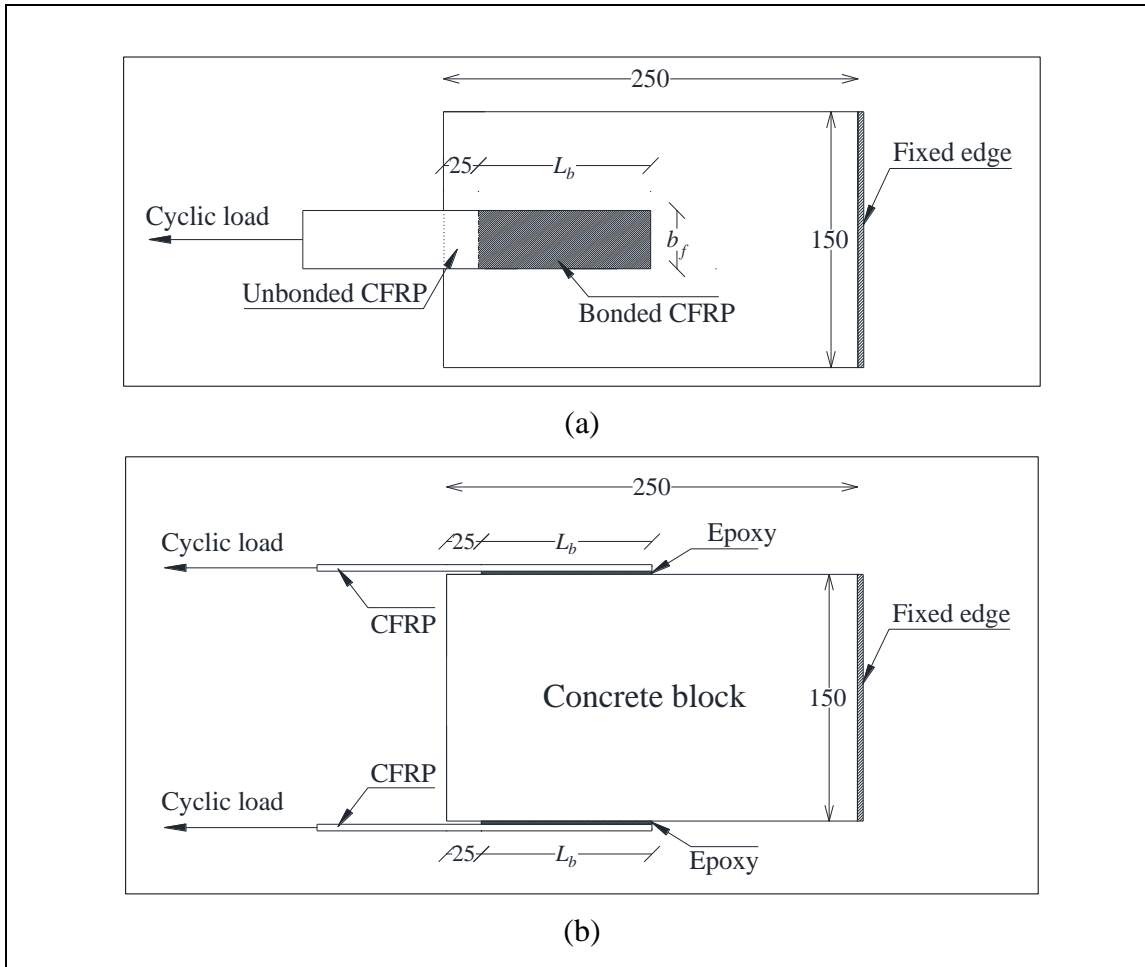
Scheme of cyclic testing set-up (dimensions in mm): a) top view; b) side view
